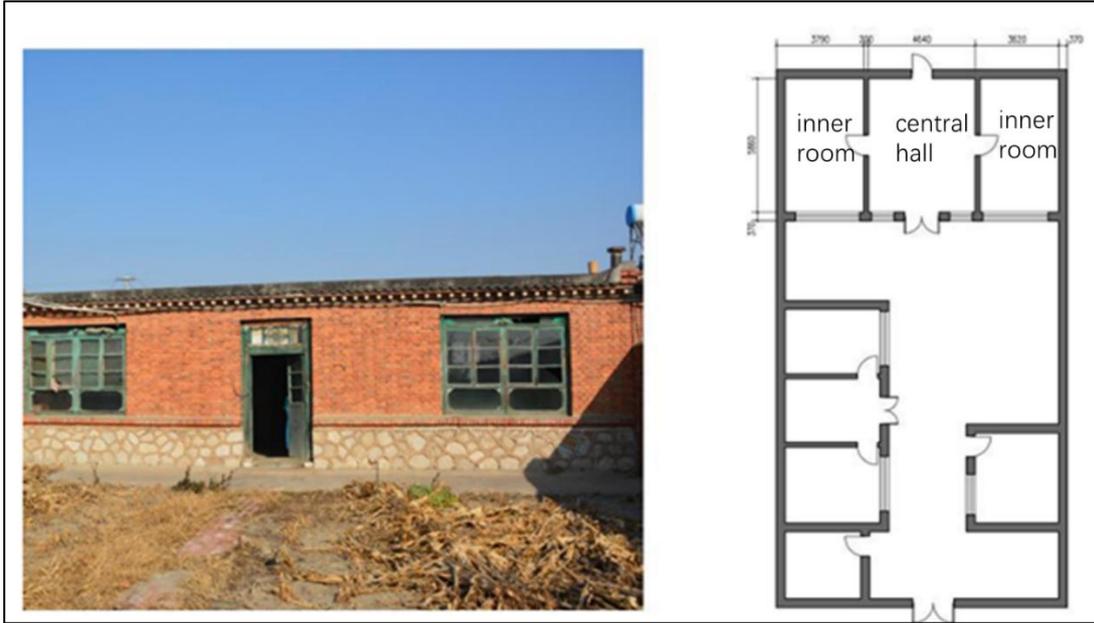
Single-story, single-entry yard farmhouse. (Adapted from Shao, 2023)
